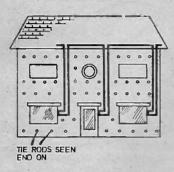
(left) Wiring of windows and doors through the cavity walls. The tie rods prevent direct connection.
